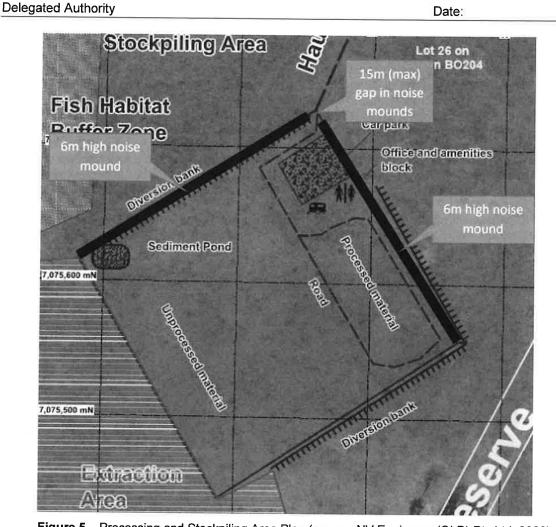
Processing and Stockpiling Area Plan (source: NV Engineers (QLD) Pty Ltd, 2022)
